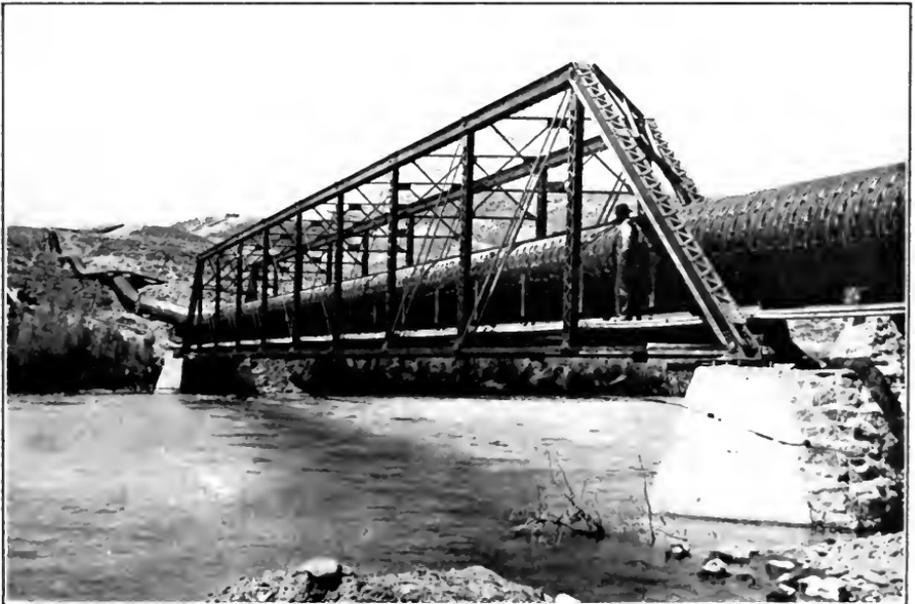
inch continuous wooden stave pipe on bridge over Bear River, Oneida Irrigation District, Idaho. 300-foot head,  $\frac{3}{4}$ -inch bands,  $\frac{5}{8}$ -inch center to center. (Pacific Tank & Pipe Co.)
